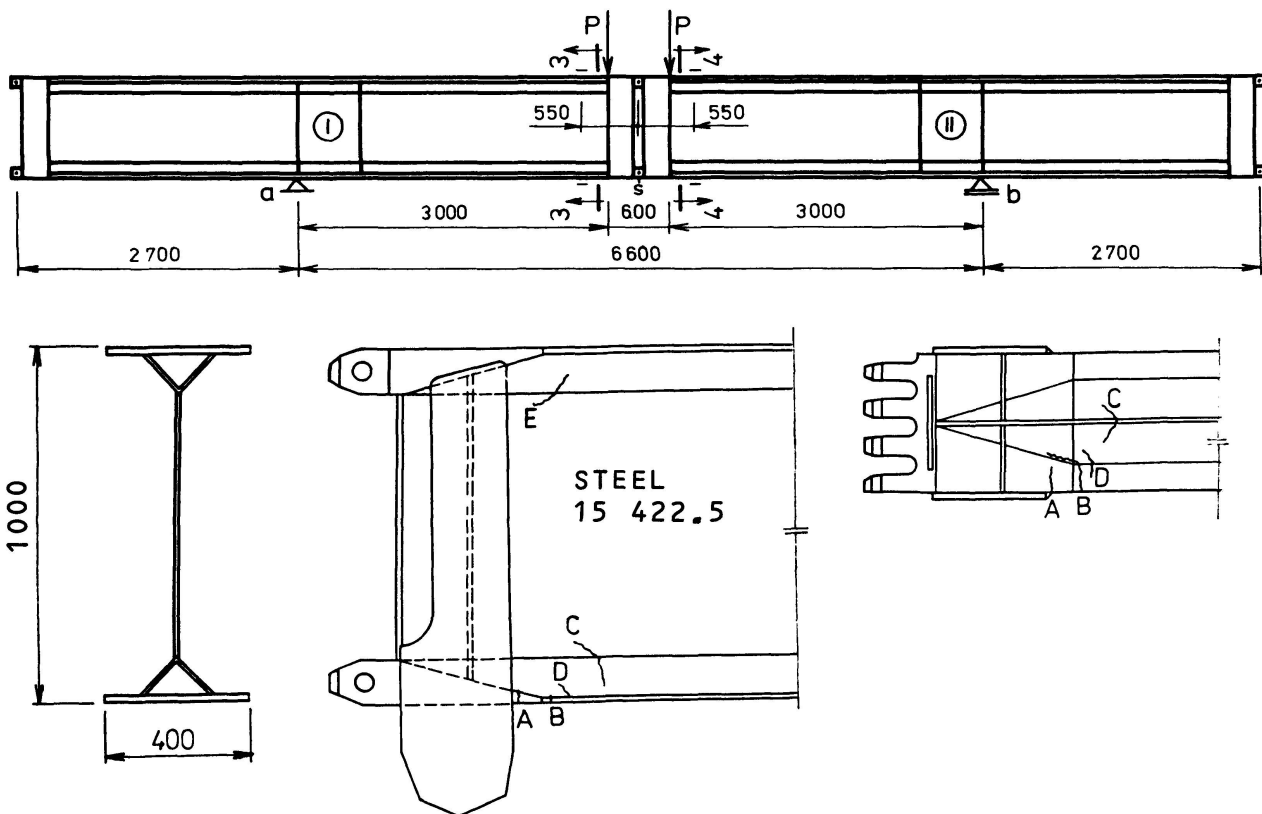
Static and geometric scheme of test system 2. Positions of fatigue cracks.
